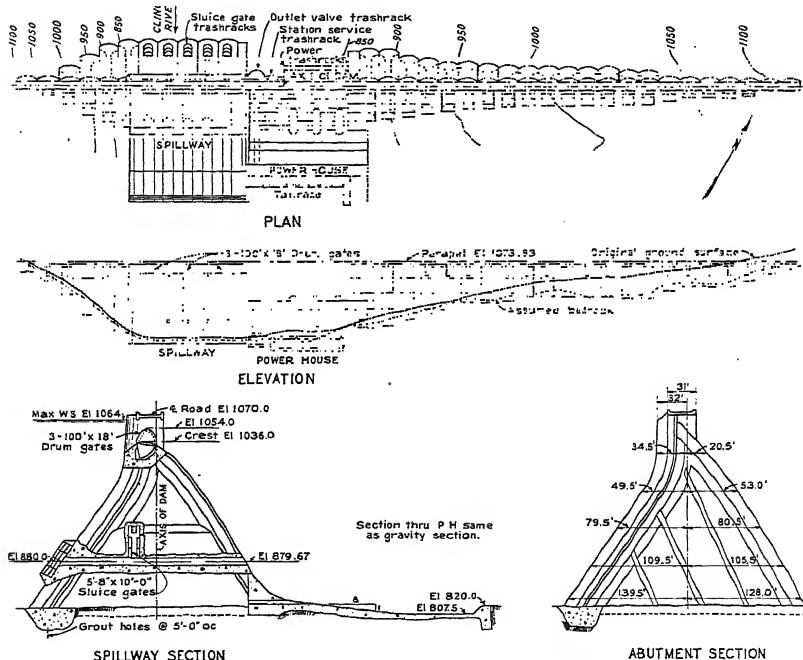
Preliminary design—Concrete round-head buttress type dam.
